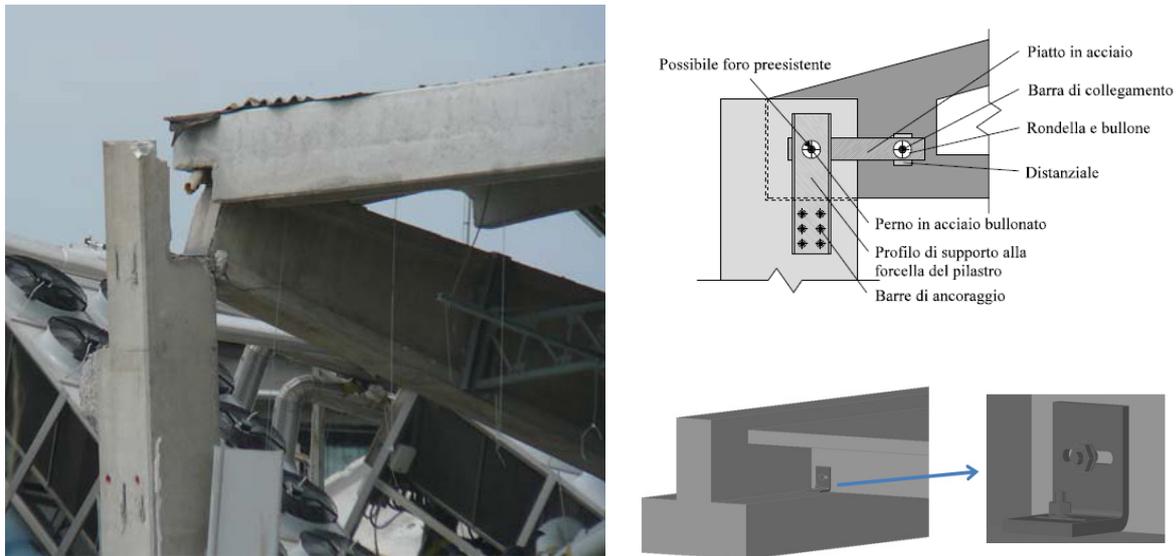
Typical collapse mechanism of prefabricated industrial buildings and possible local strengthening interventions according to guidelines (Gruppo di lavoro, 2012, www.reluis.it).
